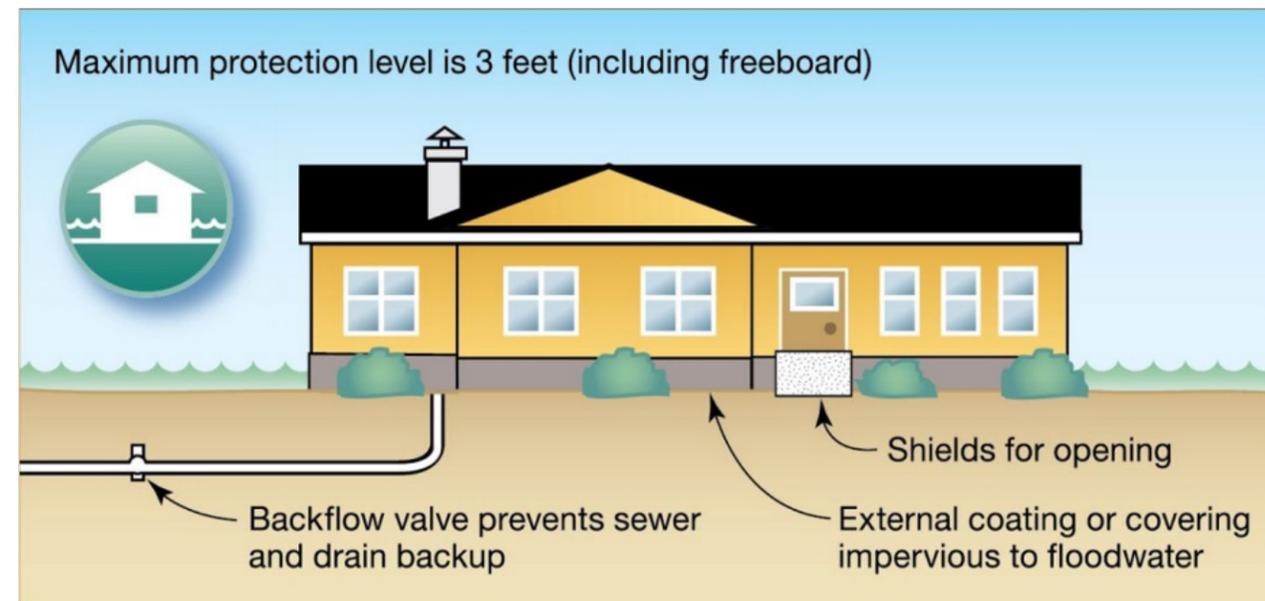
Example of ways to dry floodproof the exterior walls of a home.
